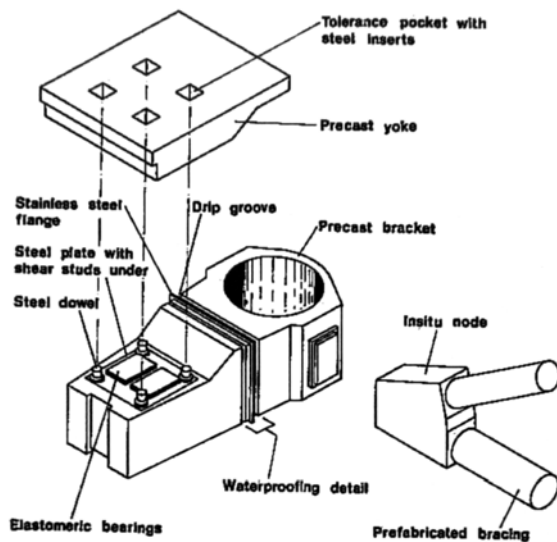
Reinforced concrete structural system of the Lloyds Building, London, Richard Rogers, architect, and Peter Rice of Ove Arup Ltd, engineer. 1984. (Rice)
